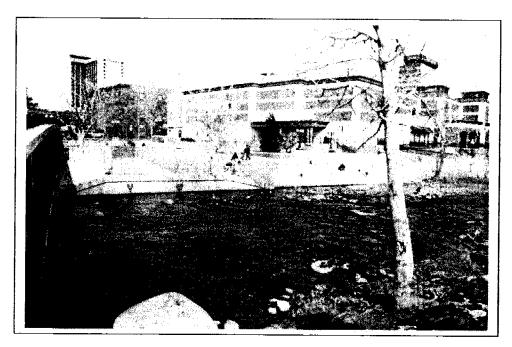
Section I, north bank, east of Arlington Avenue, camera facing northeast, 2/7/02.
